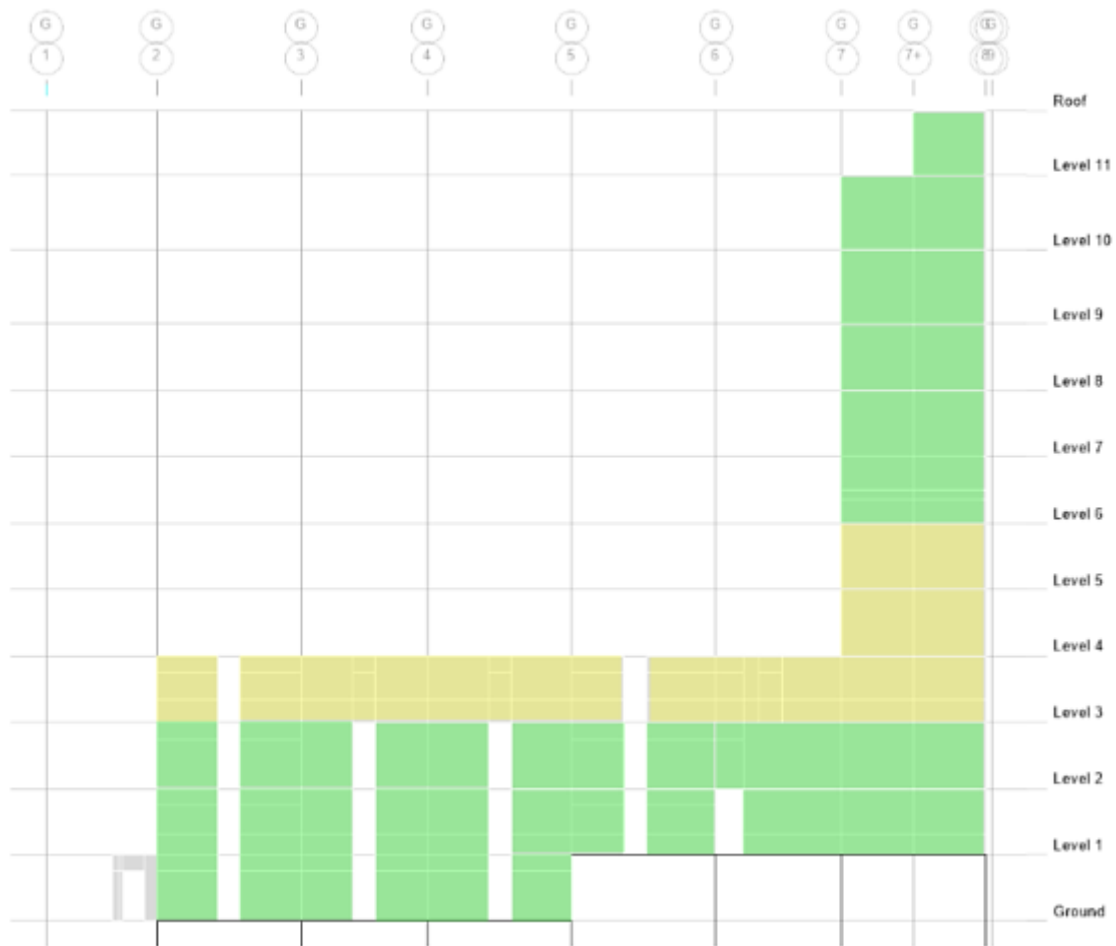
, Gridline G Longitudinal Direction Wall – North Structure
